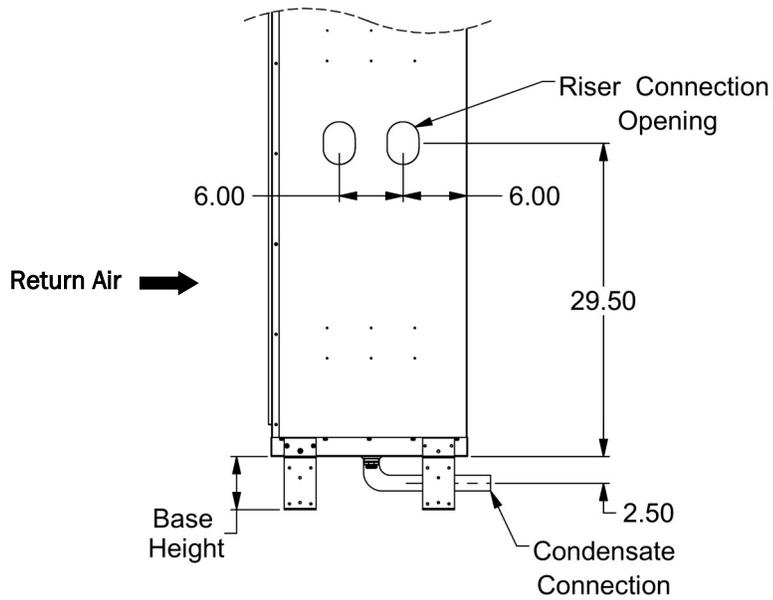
Riser Knock Out Opening Detail (Side View)
